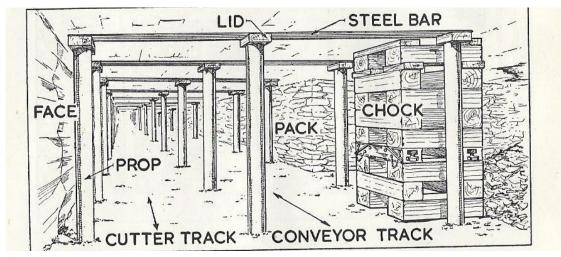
Method of Support on a Longwall Face Using Props and Corrugated Steel Straps
